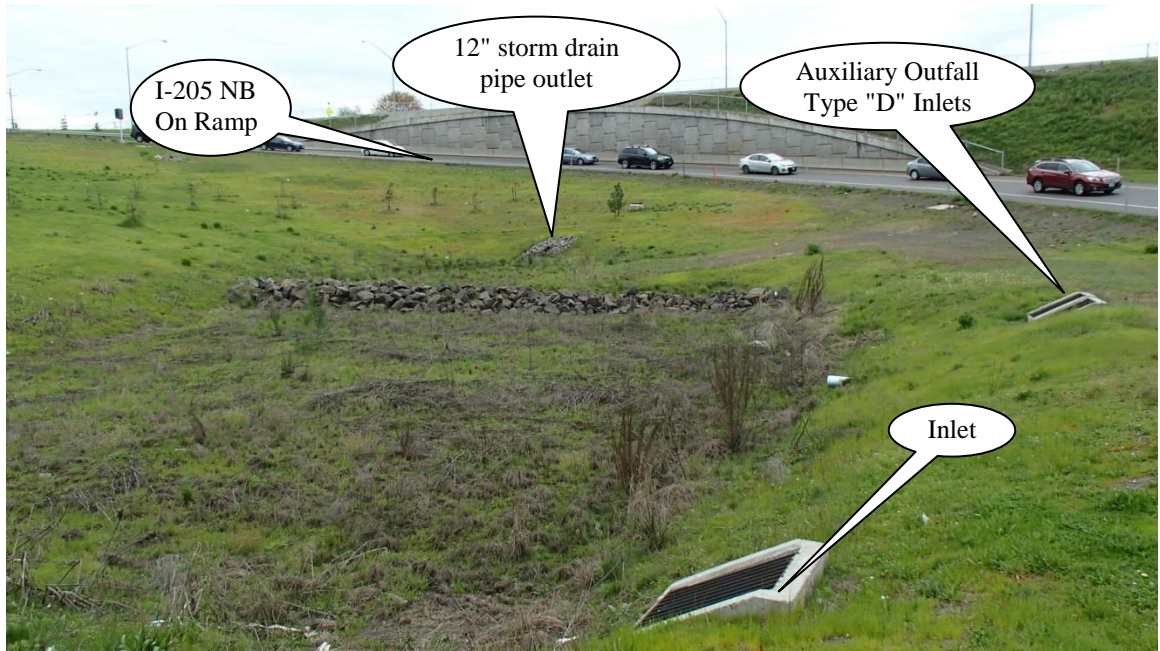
a view of bio-retention pond facility looking South toward I-205 NB on ramp.
